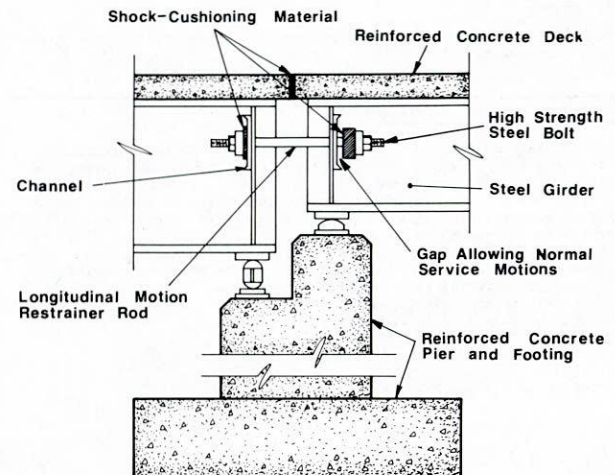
Longitudinal Motion Restrainer at a Pier
